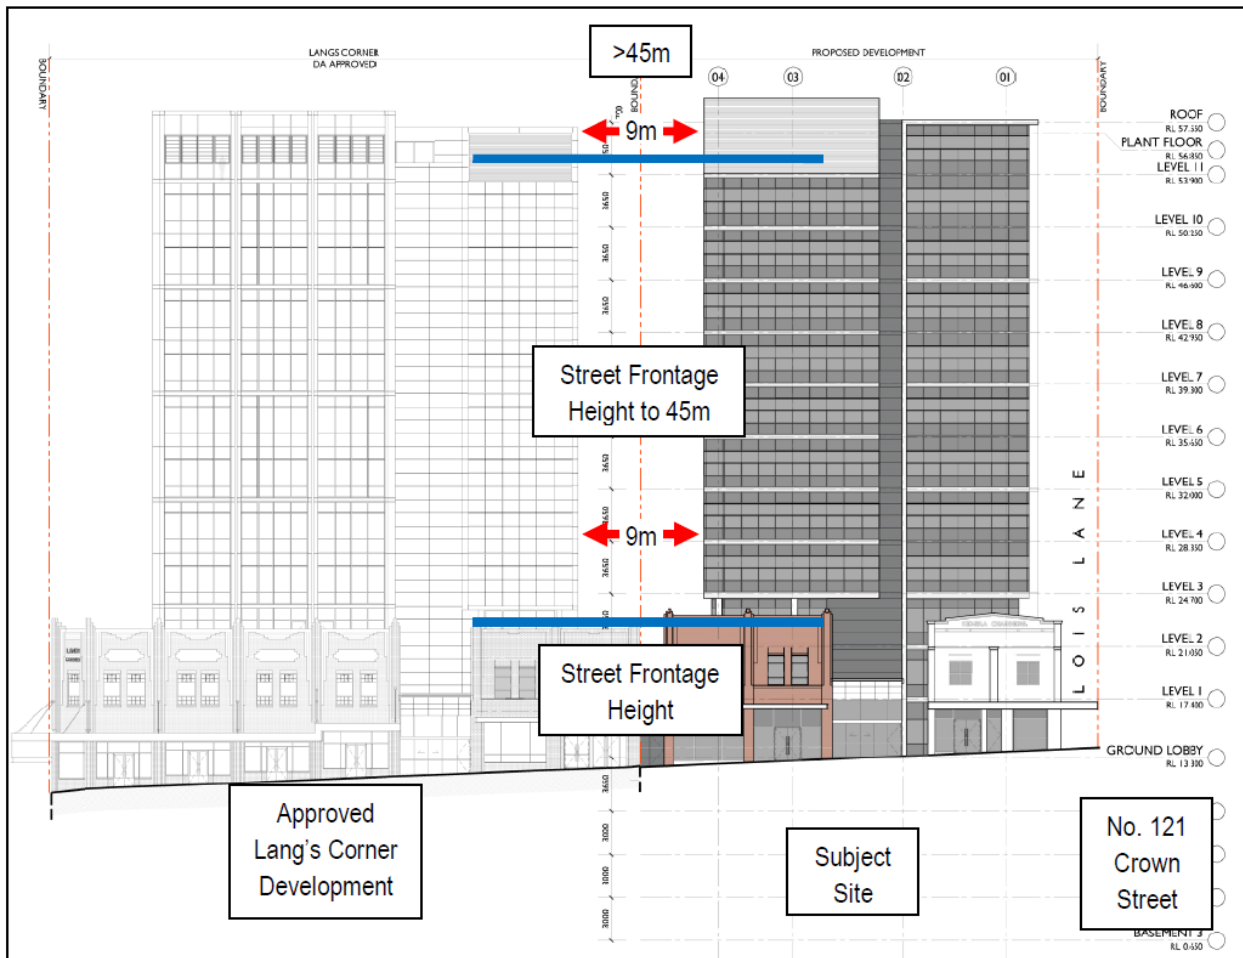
Proposed Building Separation (Source: GSA Planning)
